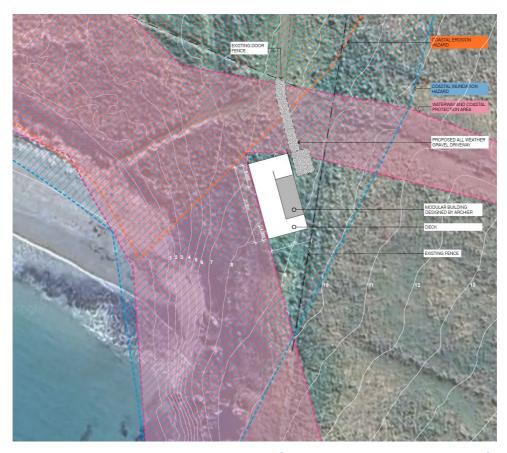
Planning Scheme Overlays maps (Source: Vi Va Design Architecture)
